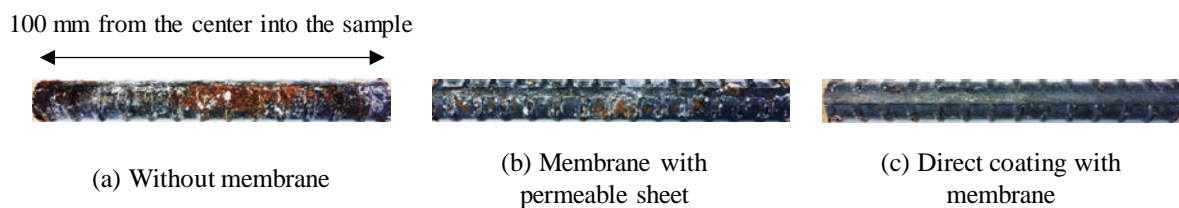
Corrosion rate of reinforcing steel bars in concrete
